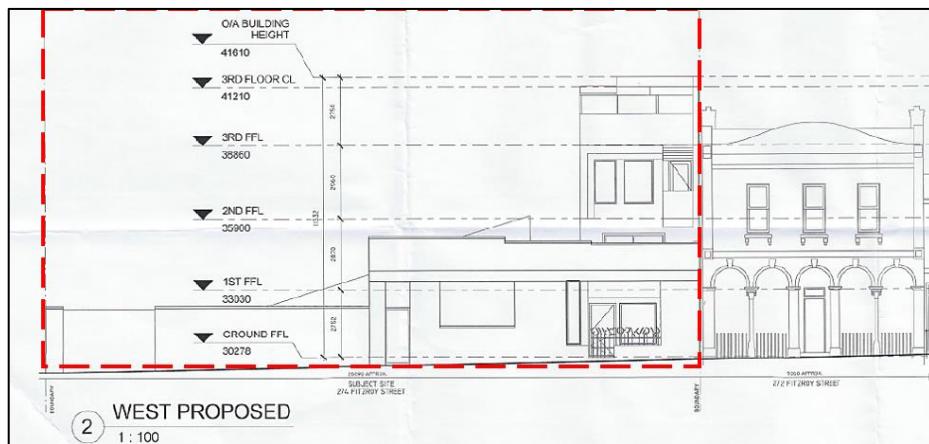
shows an extract of the endorsed western elevation dwelling approved under Planning Permit PLN14/0664.
